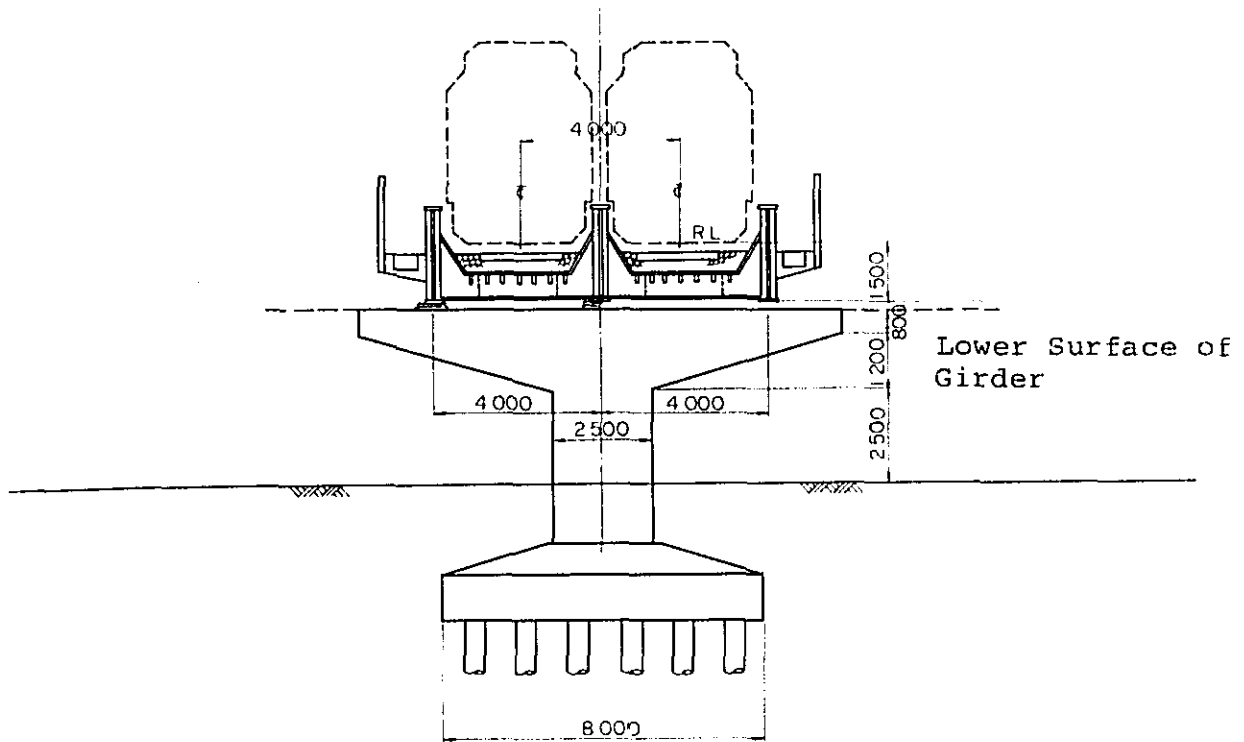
Standard Design of Through Steel Girder Bridge
